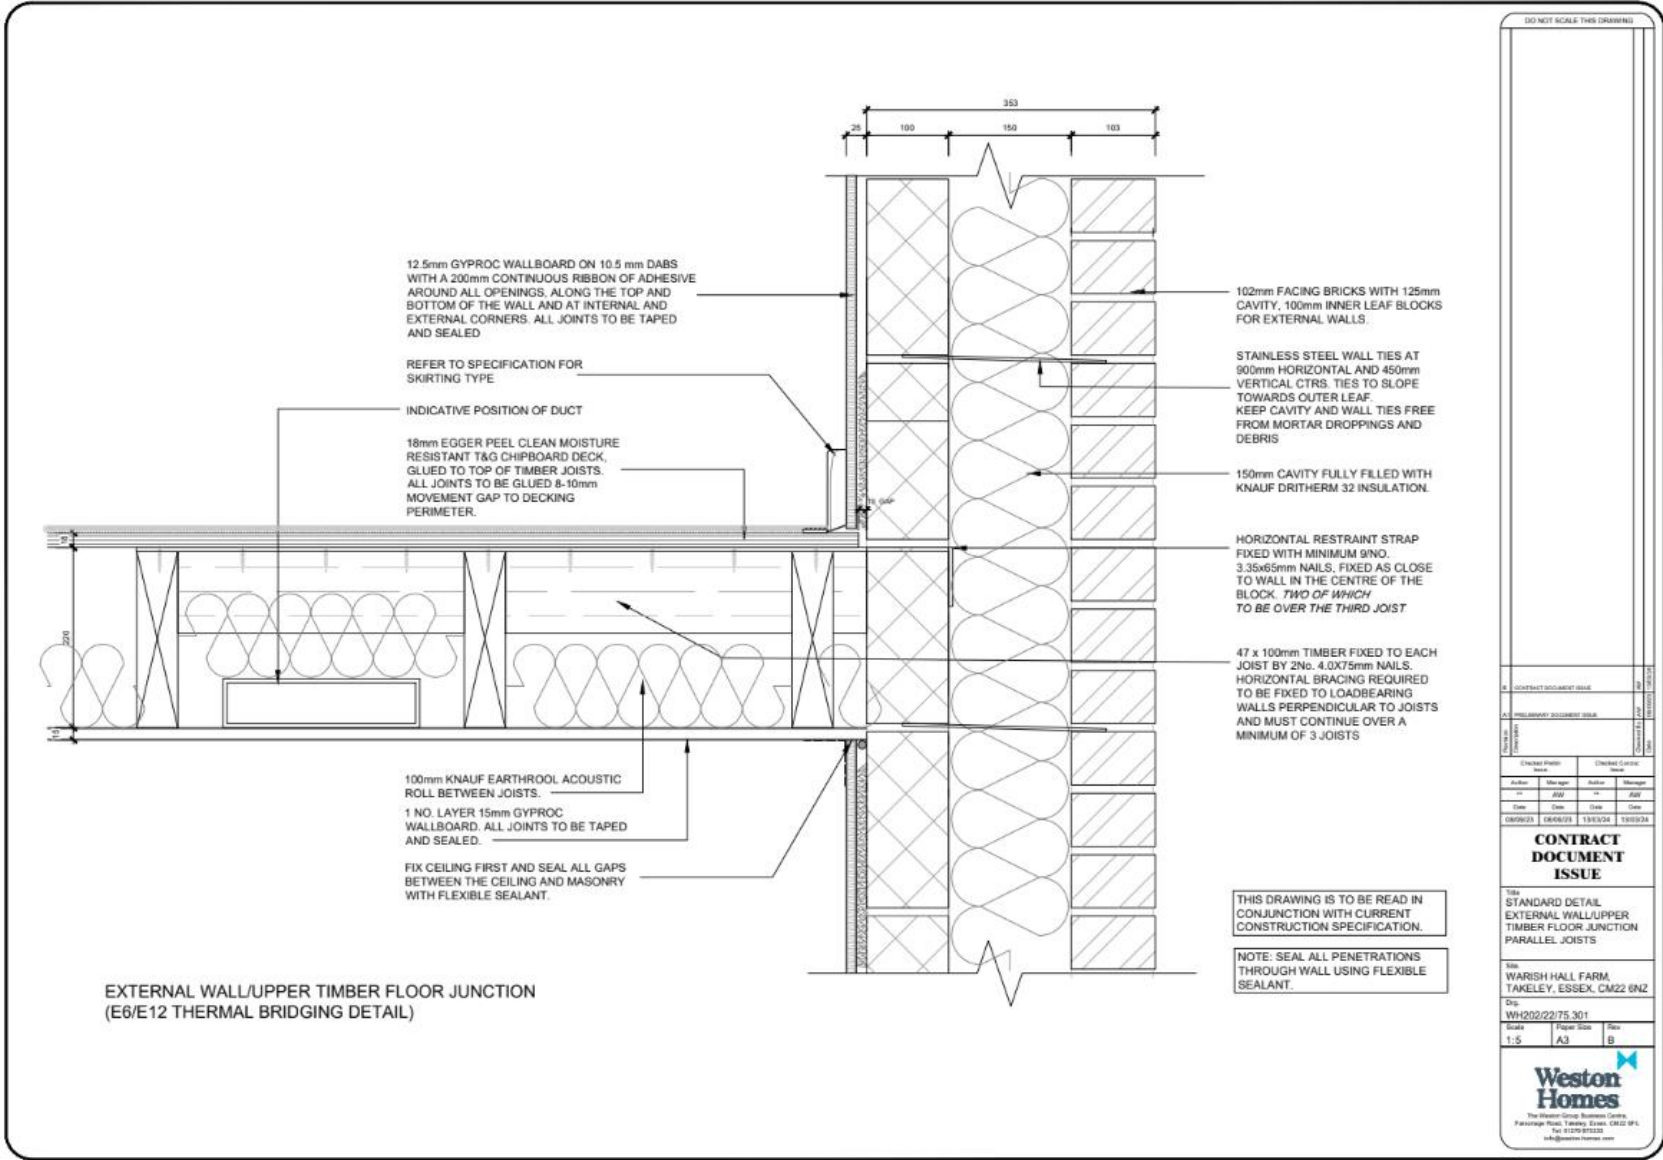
External Wall Construction Drawing WH202/22/75.301 – Jacks Lane
